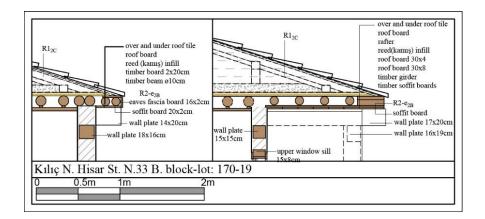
Section of timber eave covered with eaves fascia board and soffit board-Type 2B (Kılıç N. b.block-lot: 170-19)
